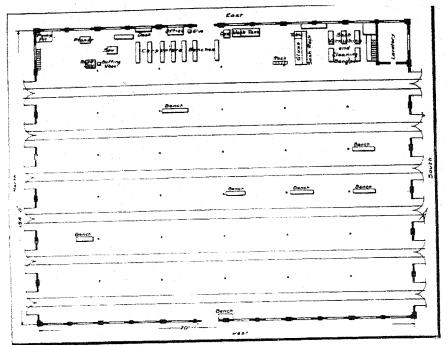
Interior Layout and Machine Distribution in Passenger Car Shop.
